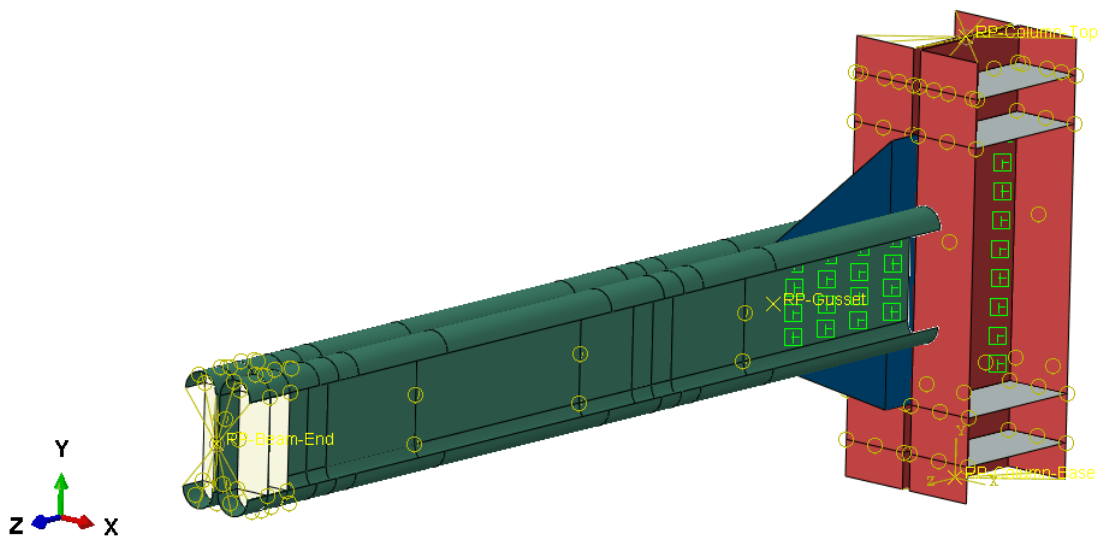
Boundary conditions of CFS beam-to-column connection
